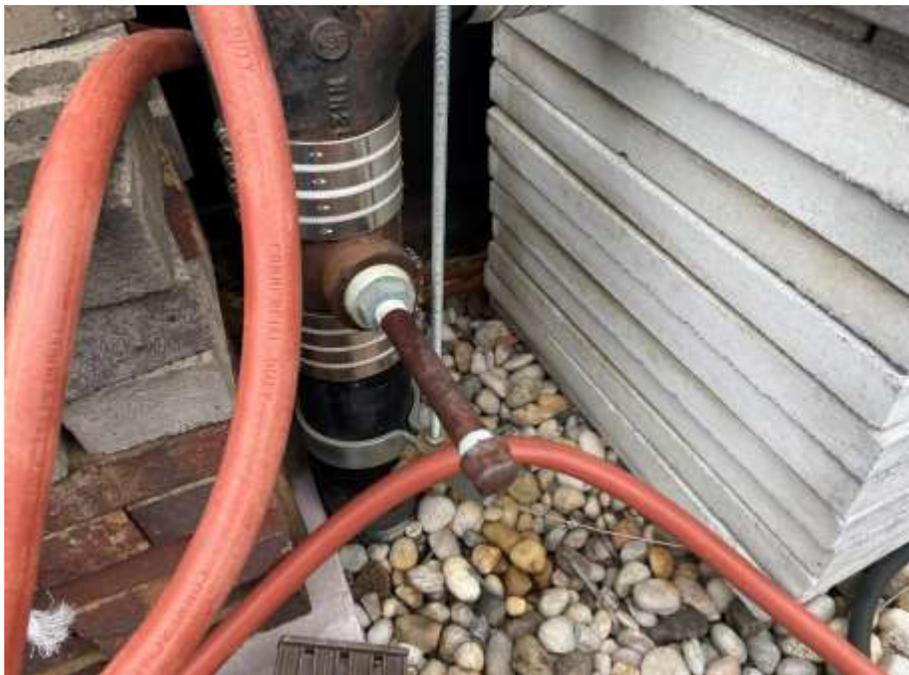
V5 riser and sample port in good condition, facing southeast. 02 March 2023.
